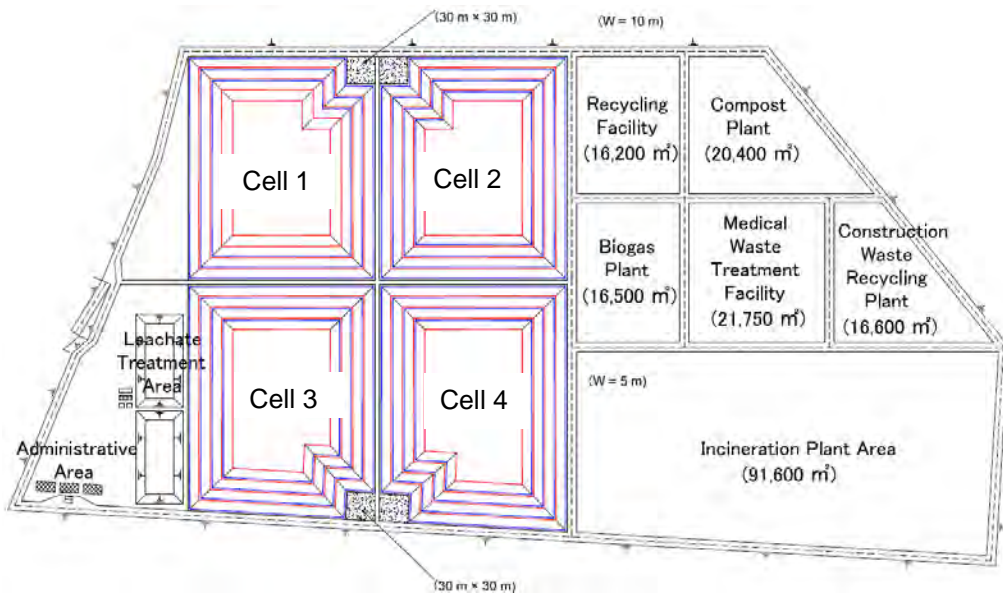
Proposed Final Layout of Nasirabad New LFS (Height of 20 m)
